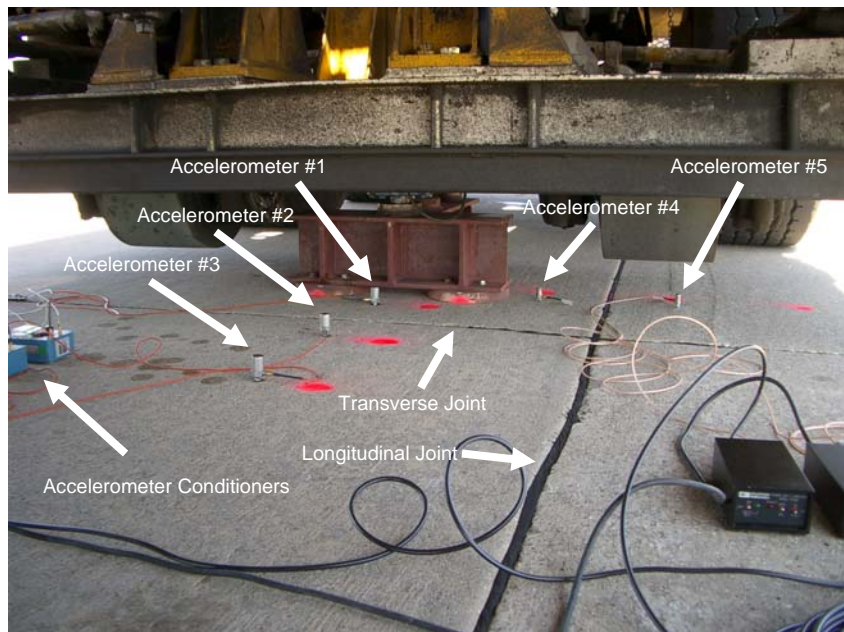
Corner Loading at North Run-Up – Supplemental Test Setup
